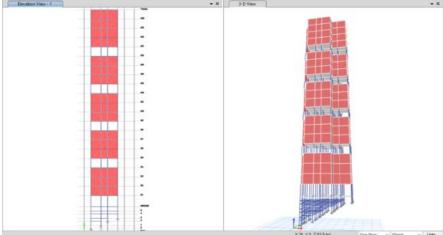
Elevation & 3D view of the building without bracing on 25° sloping ground
